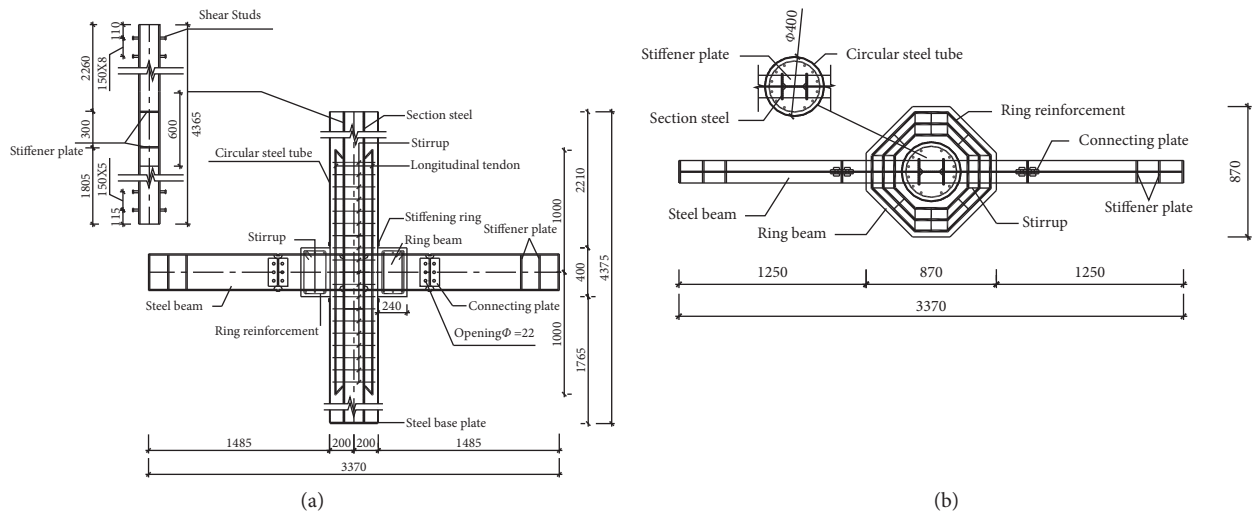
Structural diagram of specimen (SH-1). (a) Elevation (mm). (b) Plan (mm).
